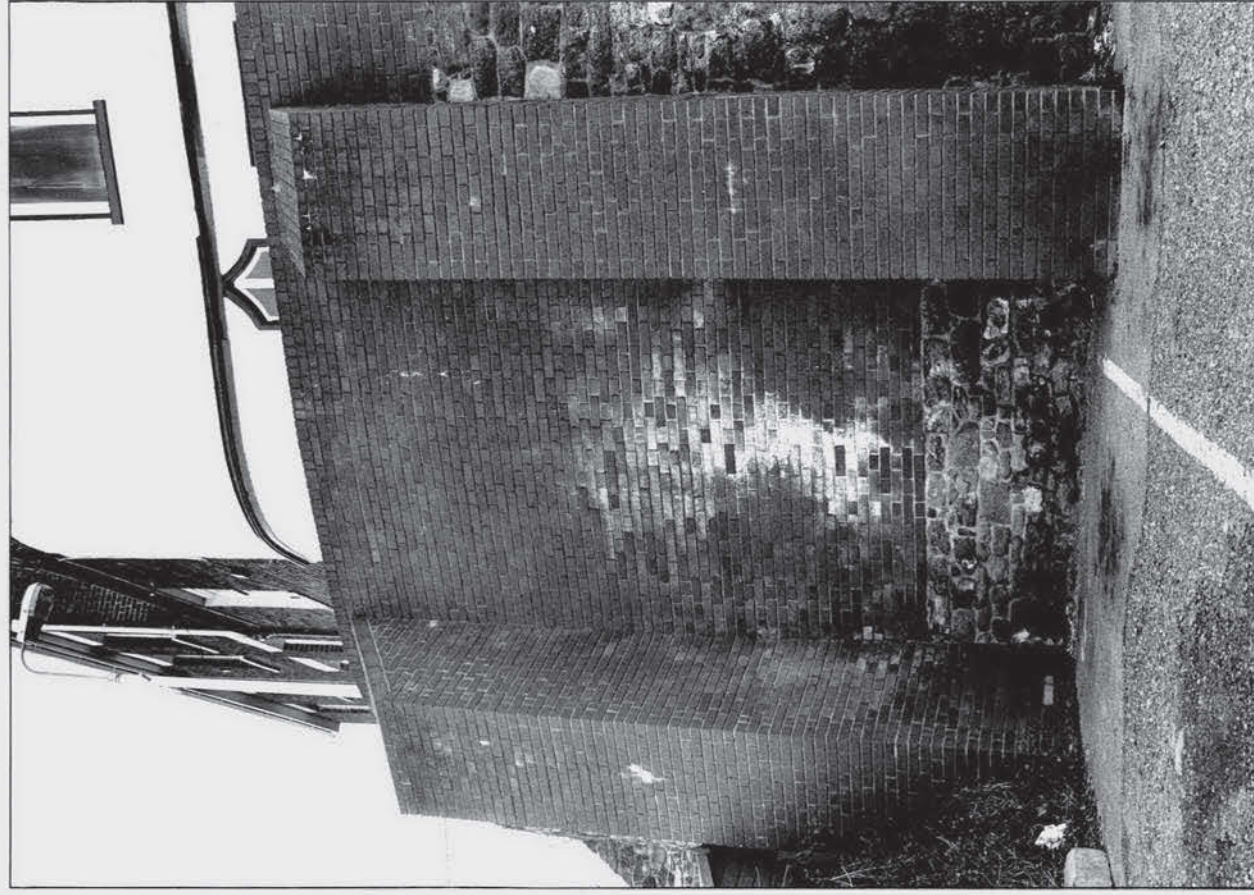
Two brick buttresses and intervening facework on the site of Snayle Tower, constructed 1980, photographed 1994.
